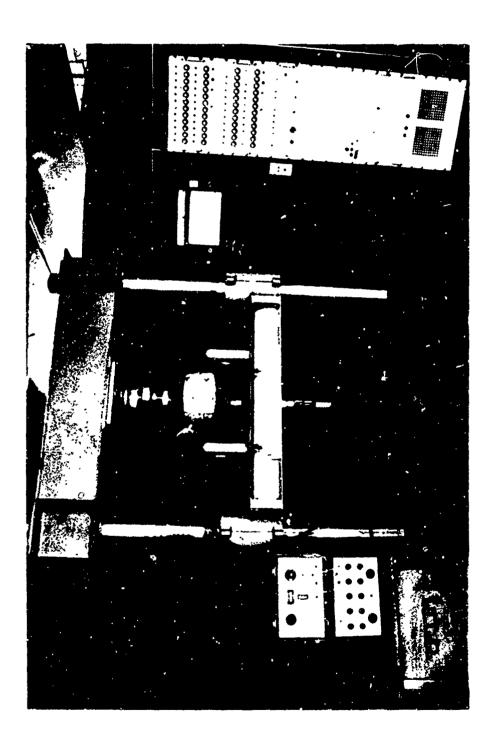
TEST SET UP FOR SPECIMENS OF LARGE DIAMETER (14")
